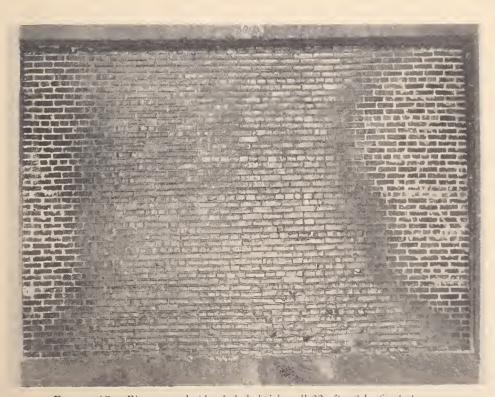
Fire-exposed side of shale-brick wall 23 after 6-hr fire test.
